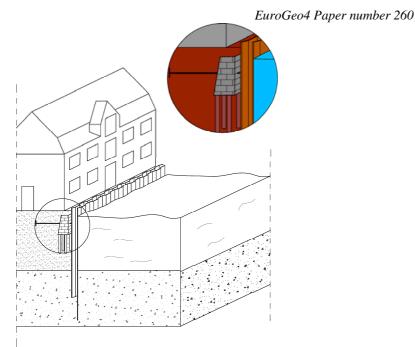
Encountered situation of the side protection of the canal (graphic: Huesker)
